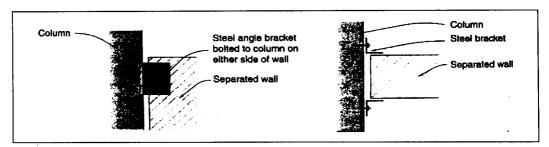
sleeve connectors to link facades walls to columns in reinforced concrete building frame structure (image taken from "Seismic Design for Architects")
